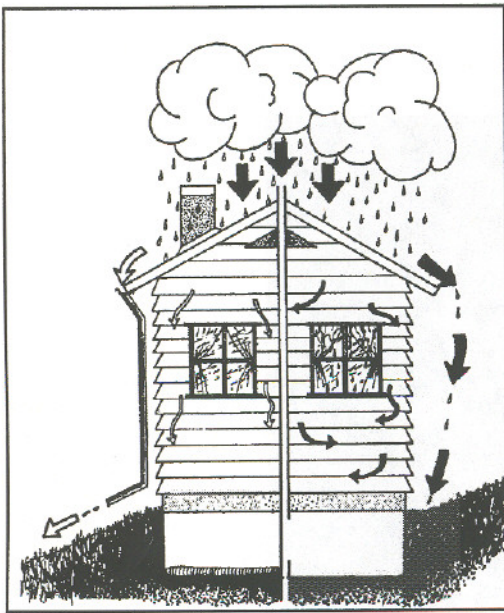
Gutters, a slope away from the house, and drainage tile in the foundation keep the left side of this house dry. No gutters, a slope toward the house, and no drainage tile expose the right side to moisture damage.
